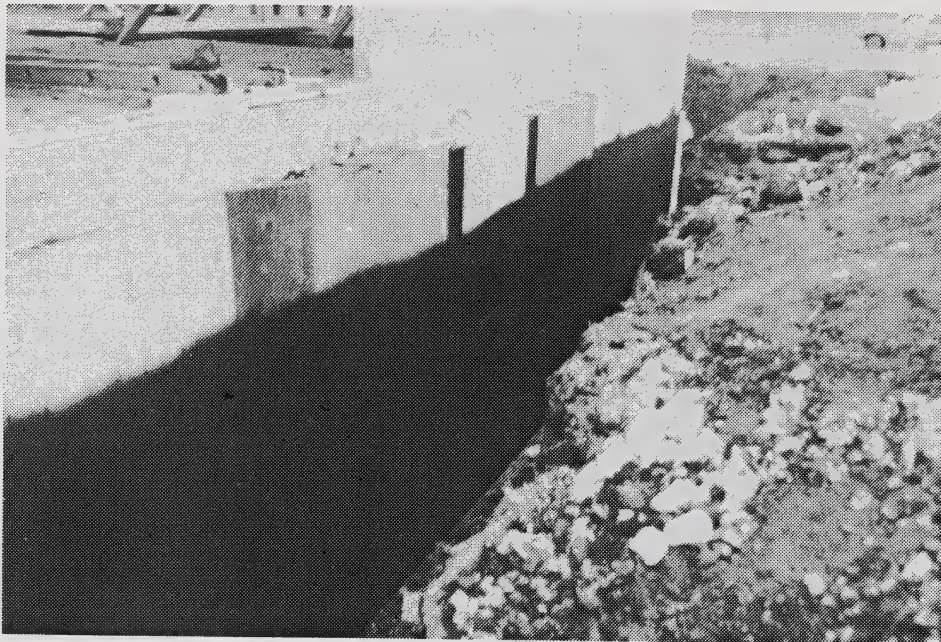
DAMPROOFED FOUNDATION WALL WITH ACTIVE/DUMMY TEST PANELS INSTALLED.
